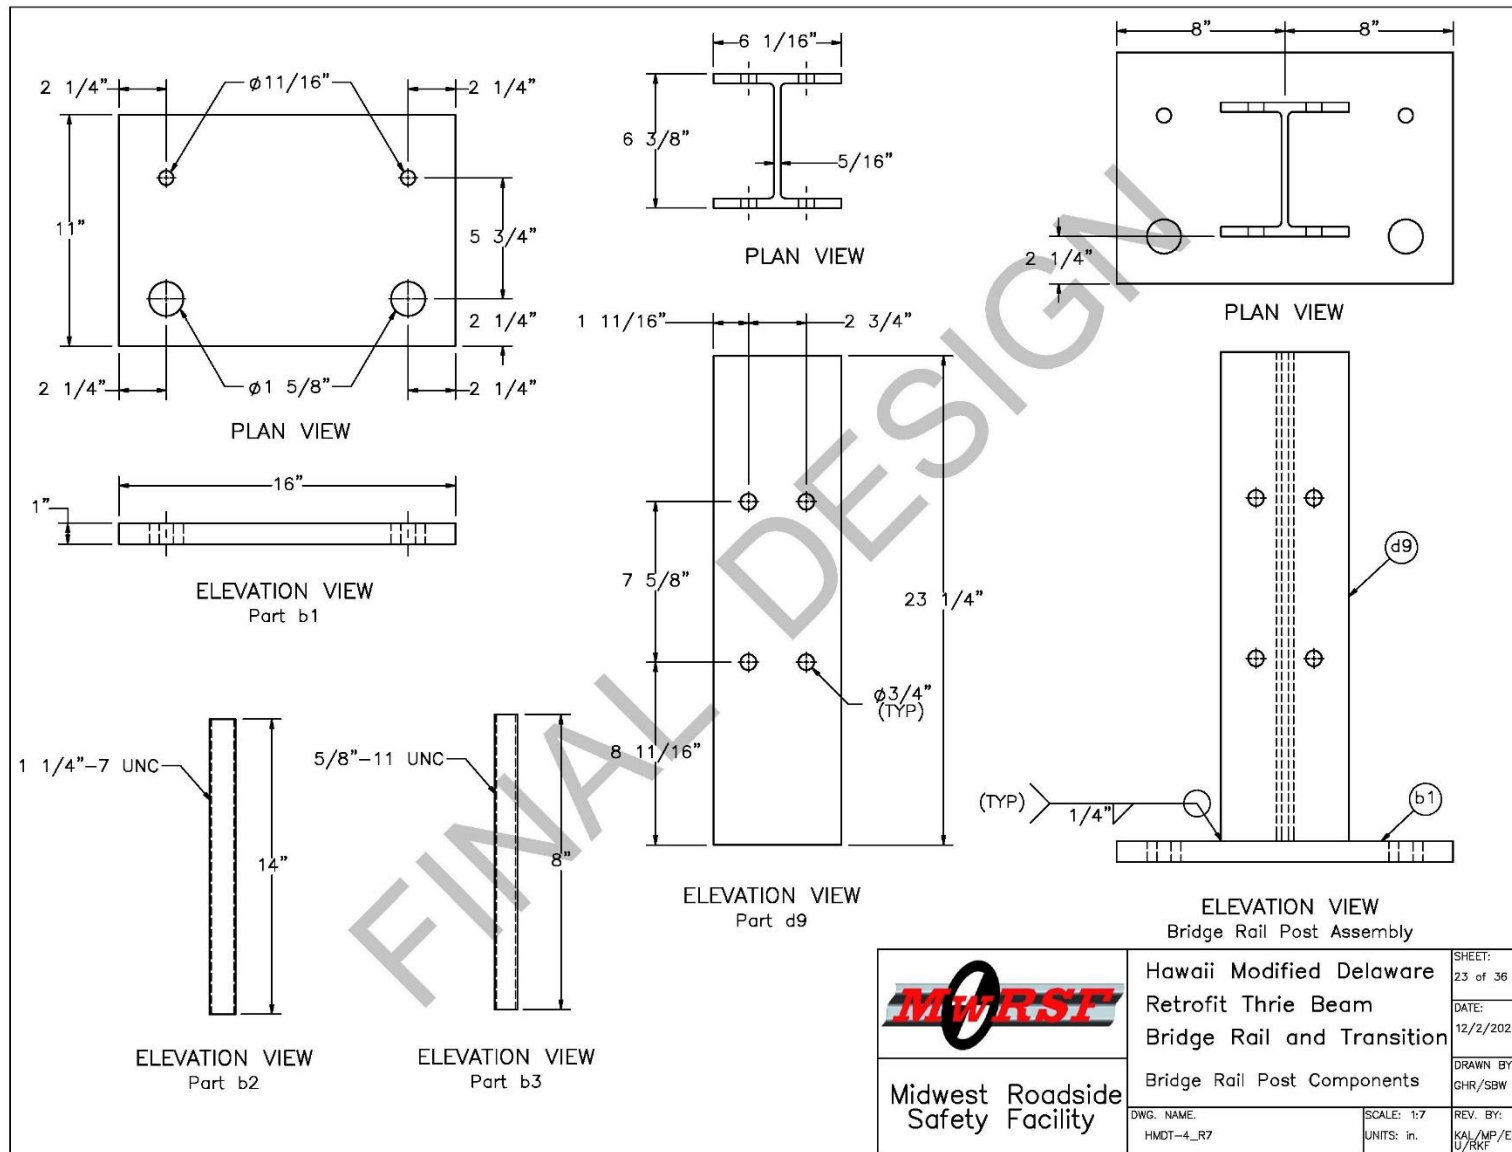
Bridge Rail Post Components, Test No. HMDT-4
